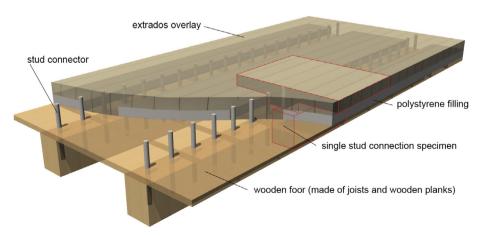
Typical solution for wooden floor retrofit with extrados overlay and lightweight panel.
